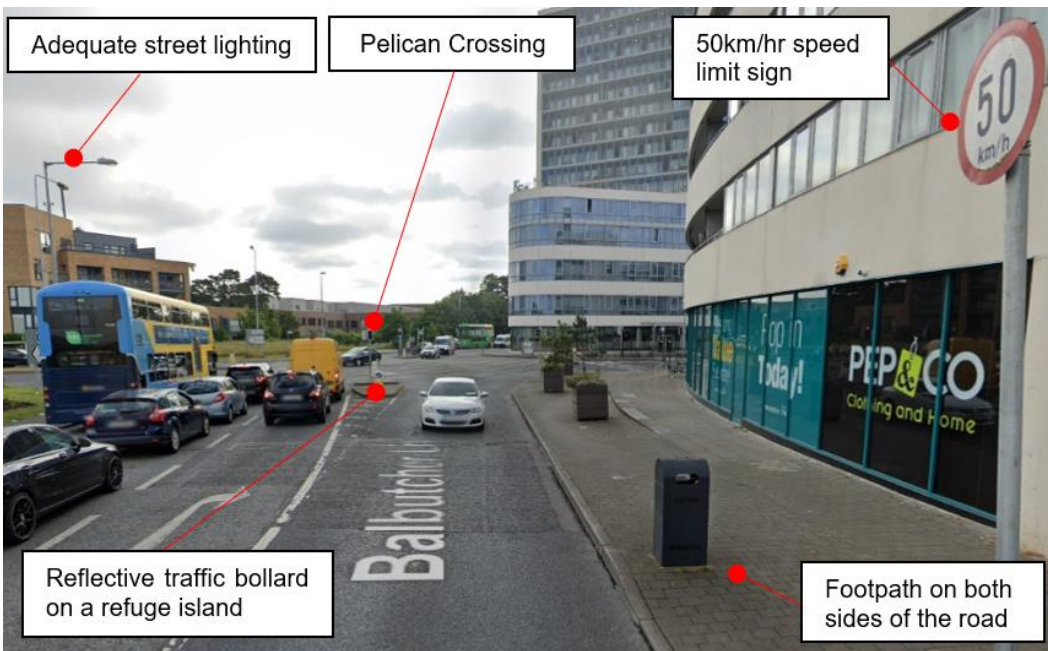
Balbutcher Lane (North of the site) Street View towards the Ballymun Road
